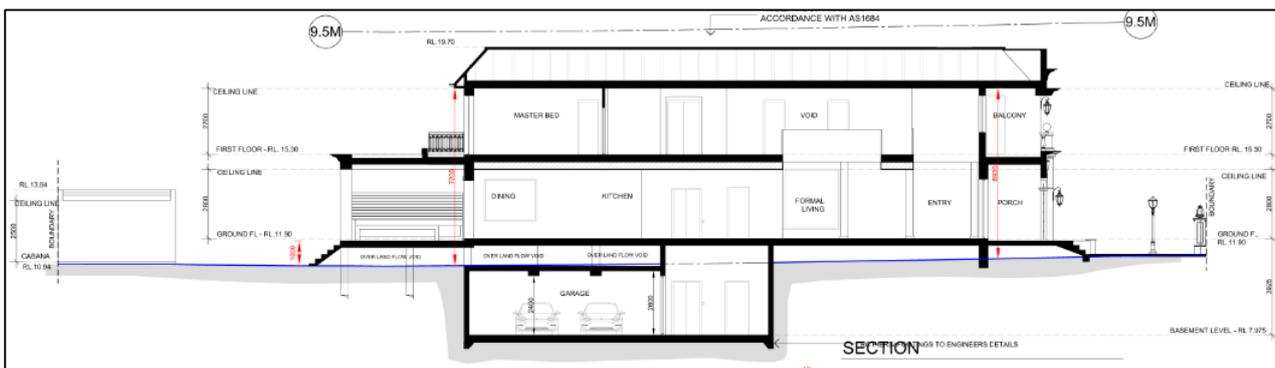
Elevation section of the proposed dwelling house (excludes the chimney).
